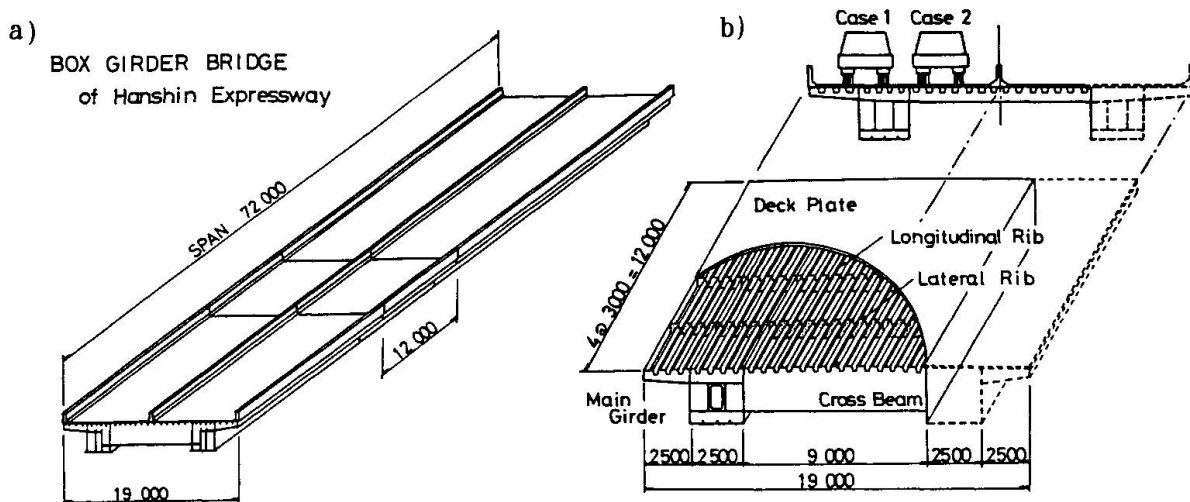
Analytical model of box girder bridge with orthotropic steel deck
